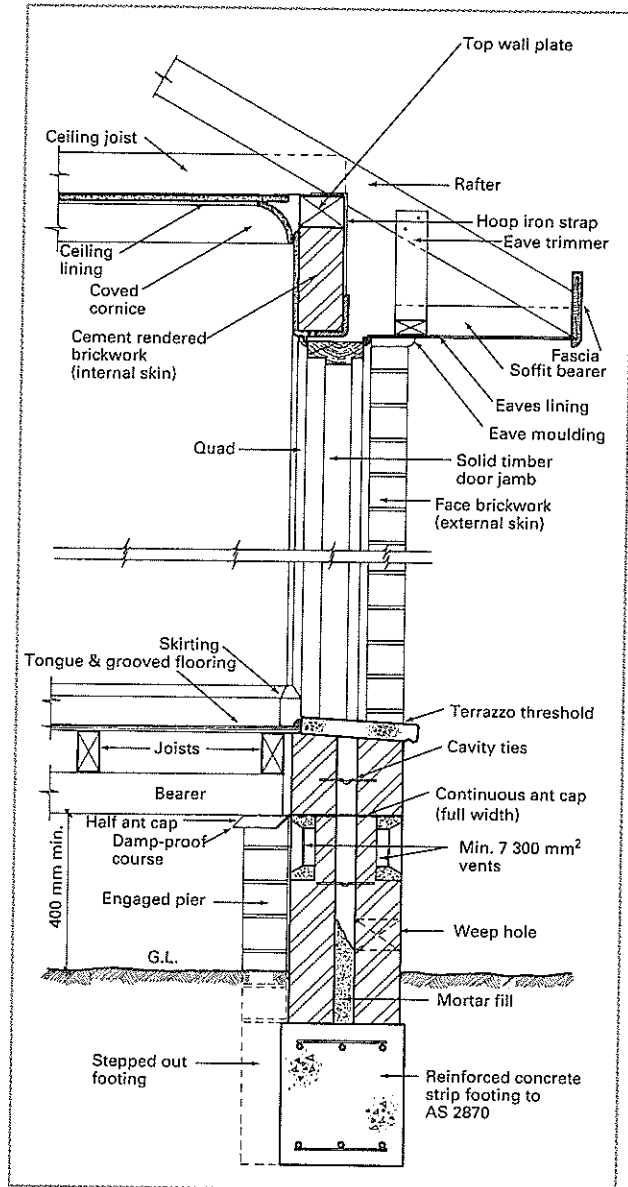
Vertical section through an external cavity brick wall and timber door jamb
